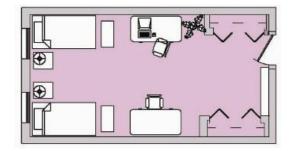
Floor Plan of Traditional Double Occupancy Room
